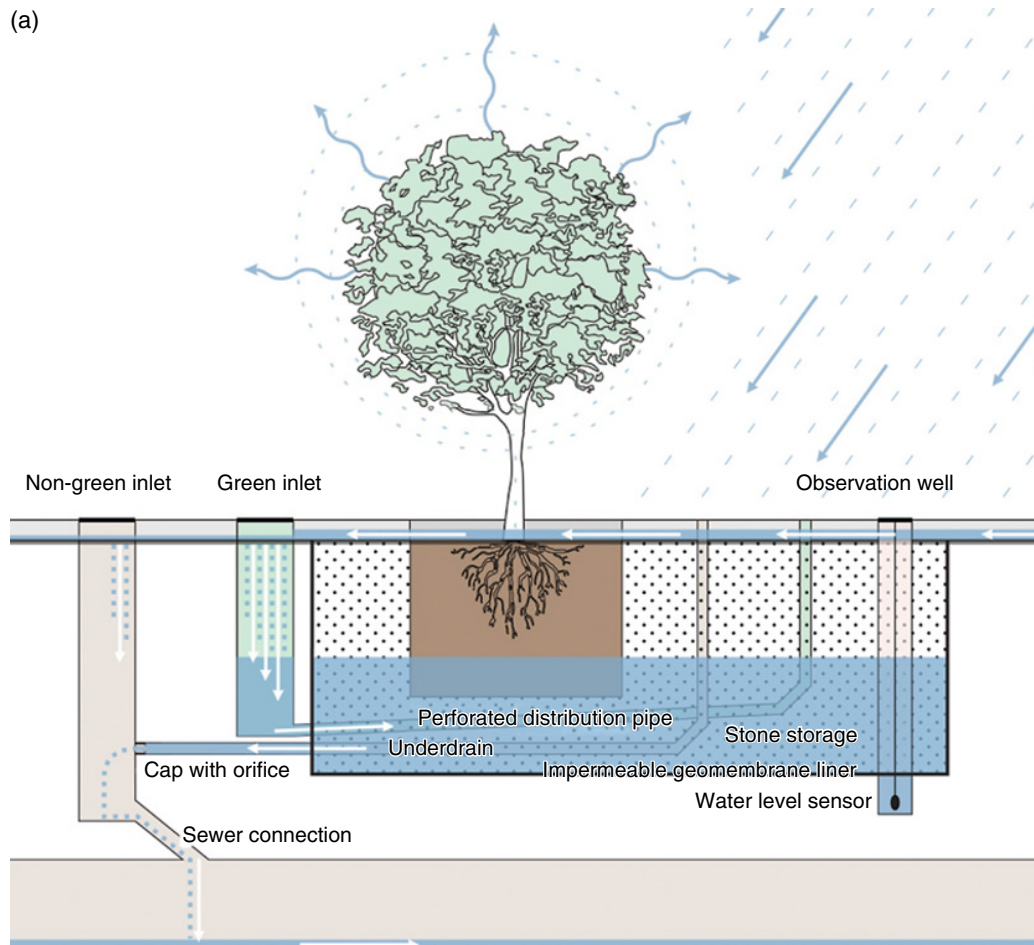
(a) Tree trenches with a cap between the under drain and the sewer inlet can be designed to either promote infiltration of stormwater into the ground or to delay its eventual release into the sewer system. For infiltration into the ground, stormwater runoff flows underground through a perforated distribution pipe into a layer of gravel or stone, watering the trees and slowly infiltrating into the ground through a bottom layer of sand. For diversion, stormwater can instead be designed to be temporarily retained and infiltration prevented by an impermeable liner that forces excess water that is collected through a distribution pipe that slowly releases it to the sewer system. Source: Green City Clean Waters. Reproduced with permission from Philadelphia Water.
